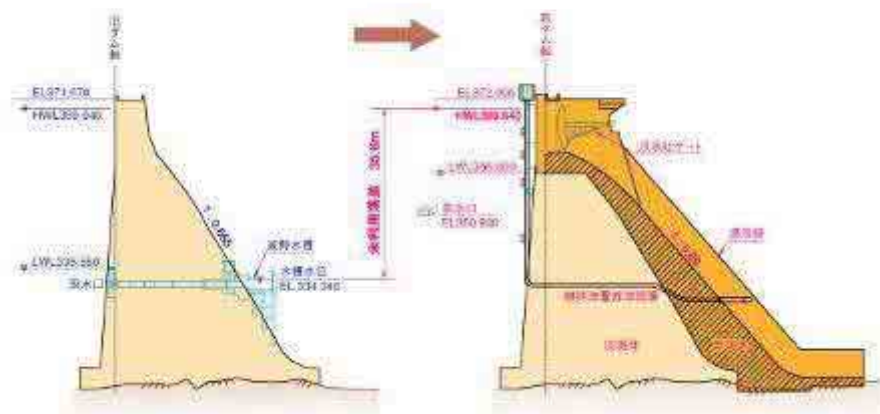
Cross-section view of the Taishakugawa Dam (before and after the restoration countermeasures)
